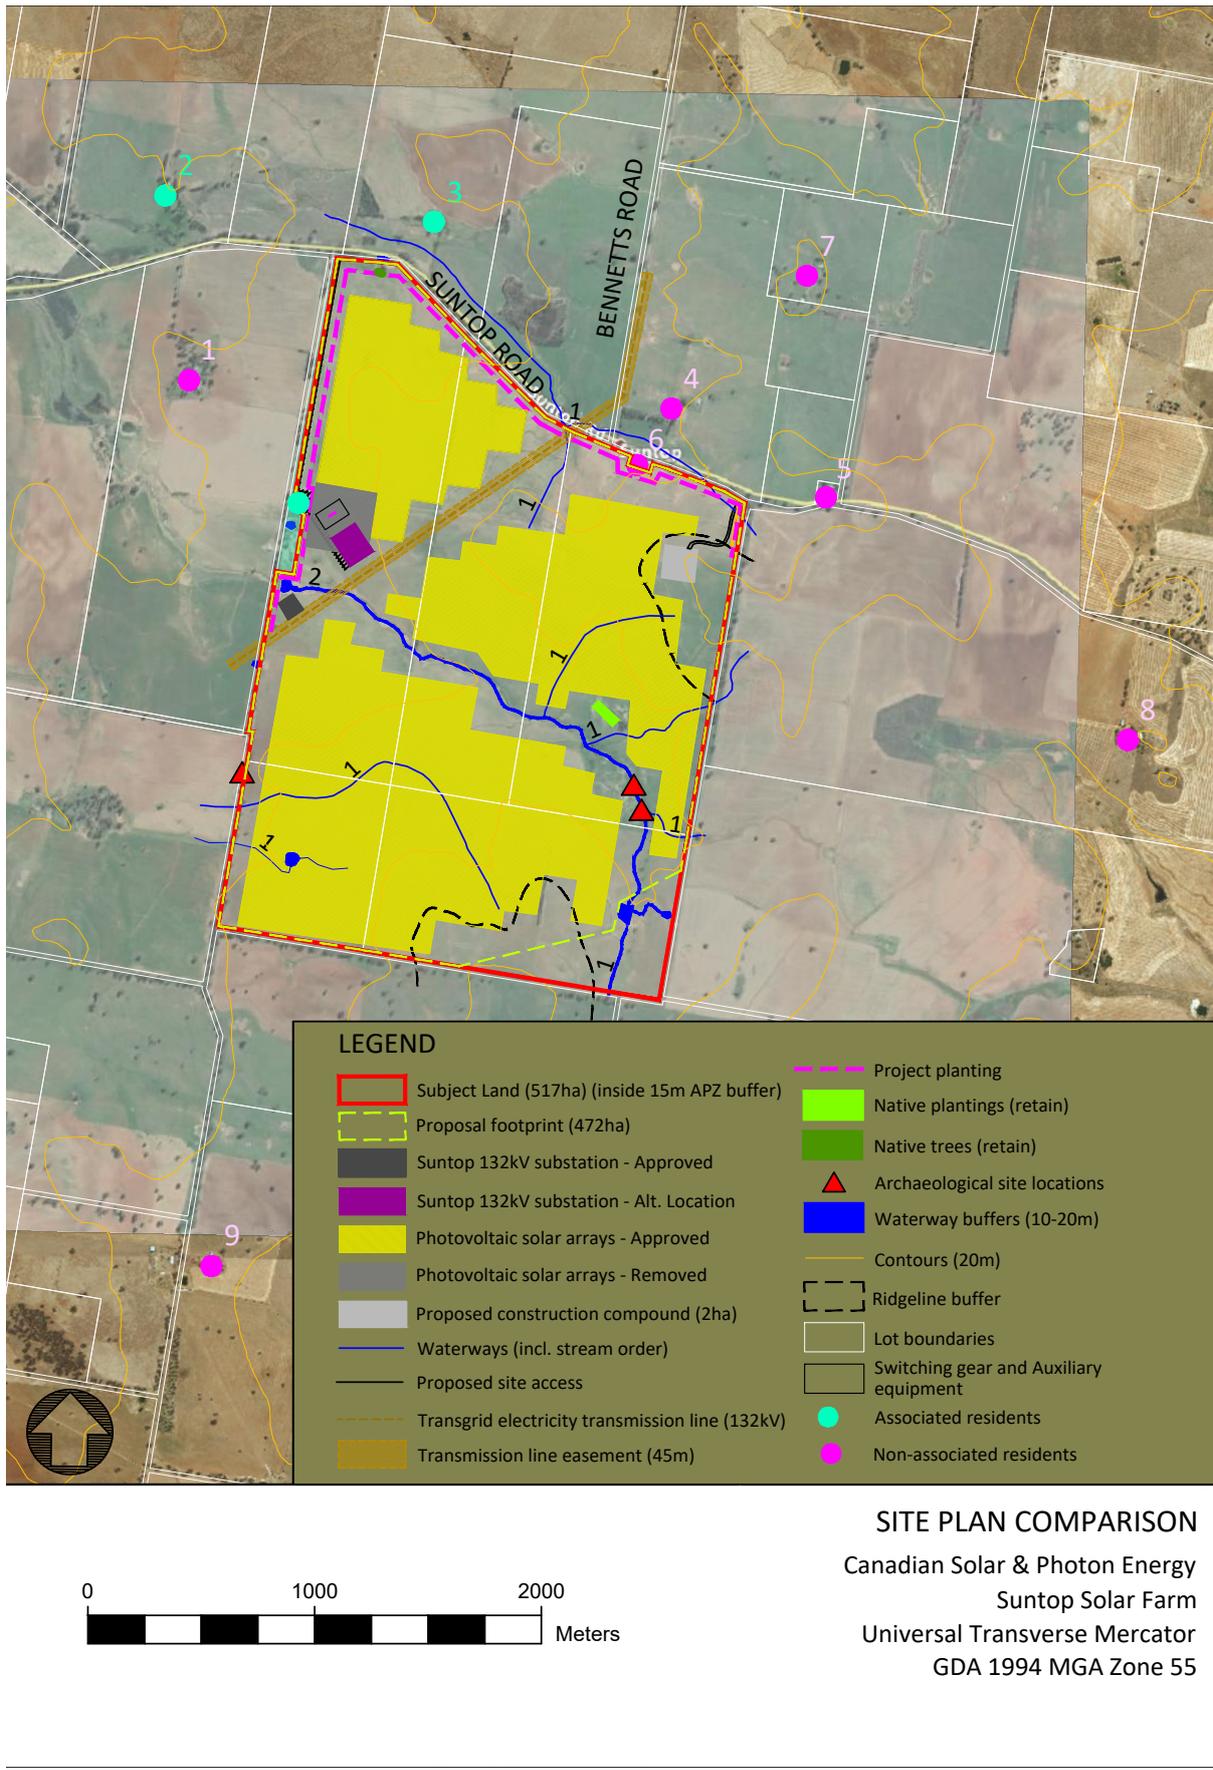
SITE LAYOUT PLAN SHOWING COMPARISON OF APPROVED AND PROPOSED SUBSTATION LOCATION
